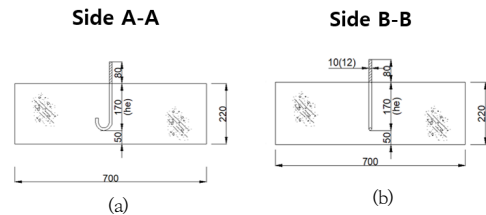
J-type anchor bolts embedded in non-cracked concrete section A-A, B-B
